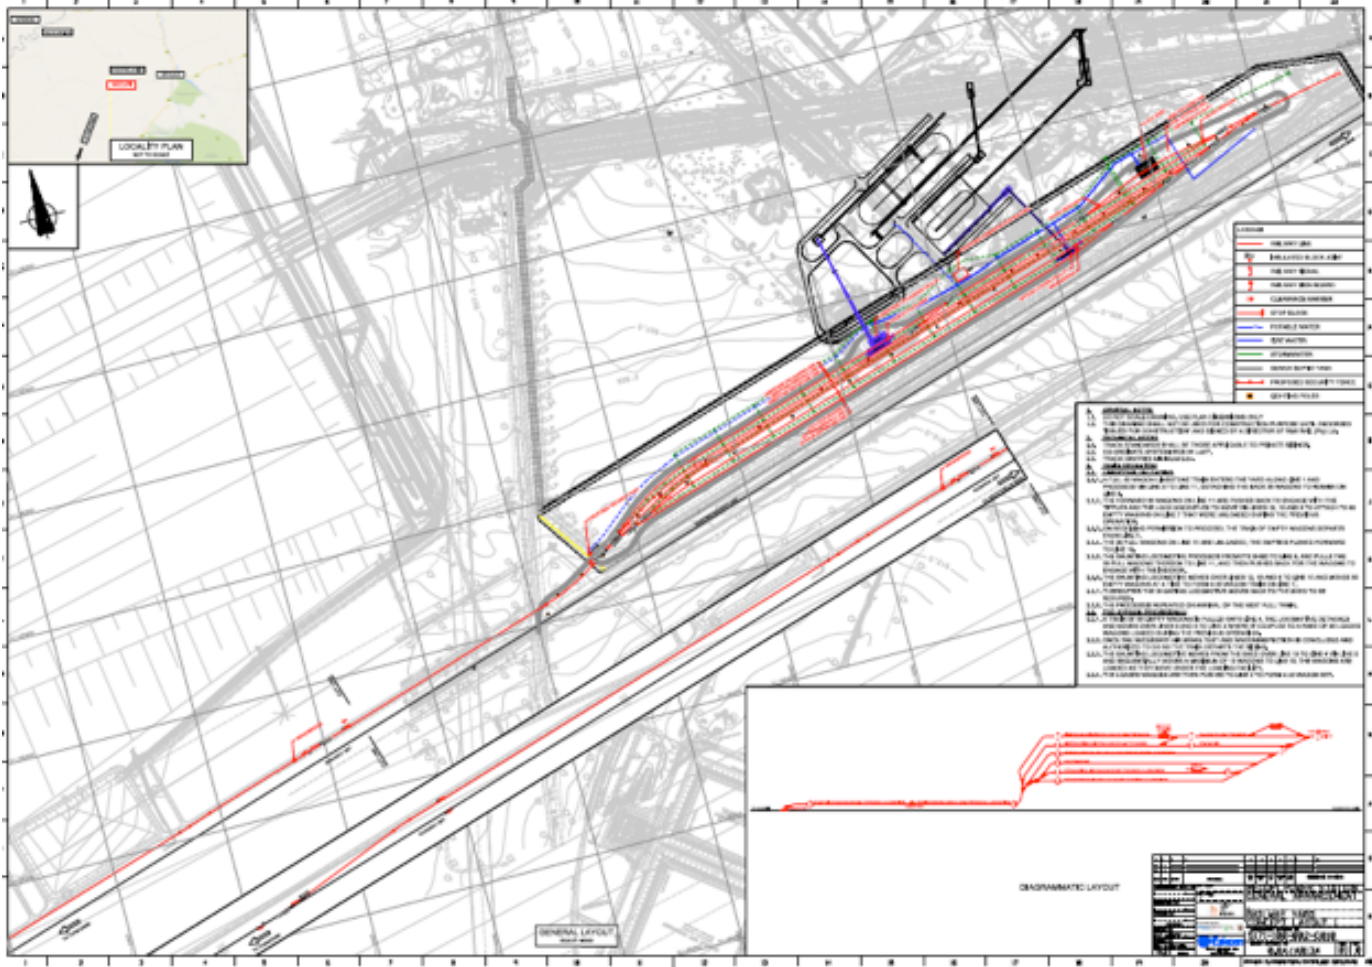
The proposed railway yard south-west of Medupi six units and south east of the existing and licensed ADF
